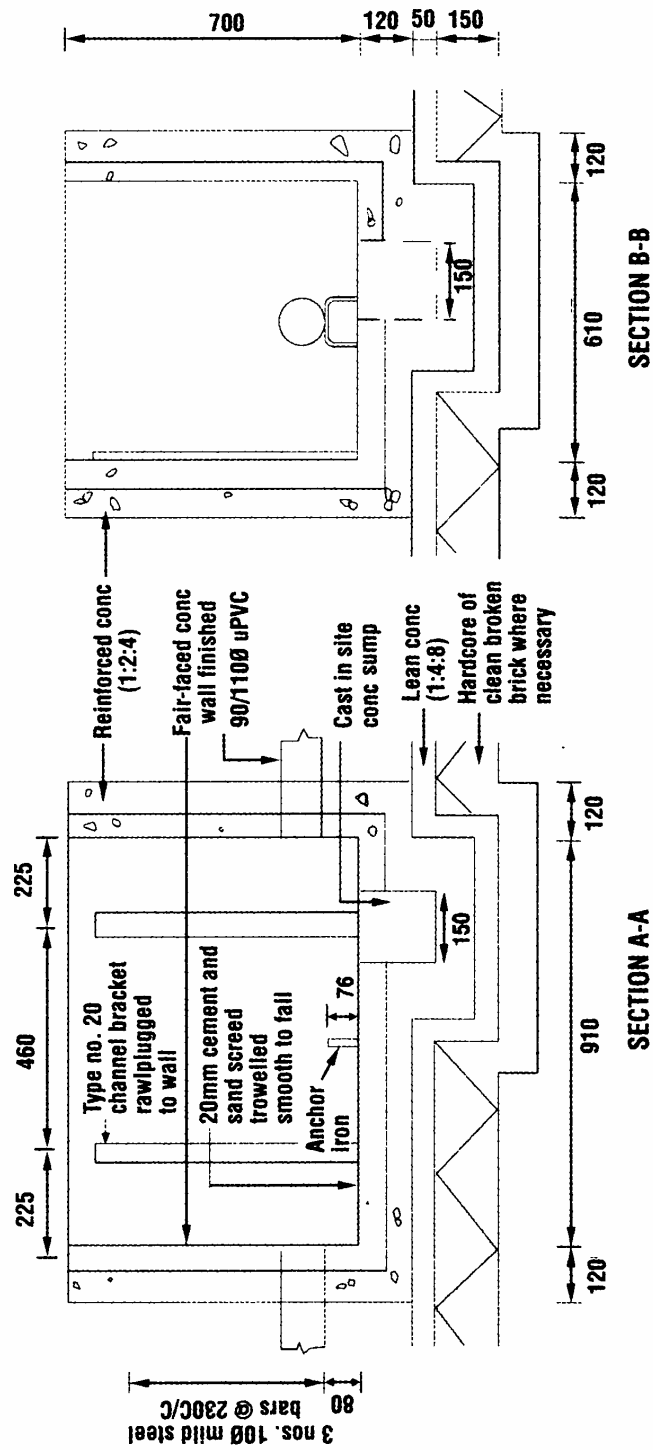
MANHOLE DRAWINGS - TYPE MX1
